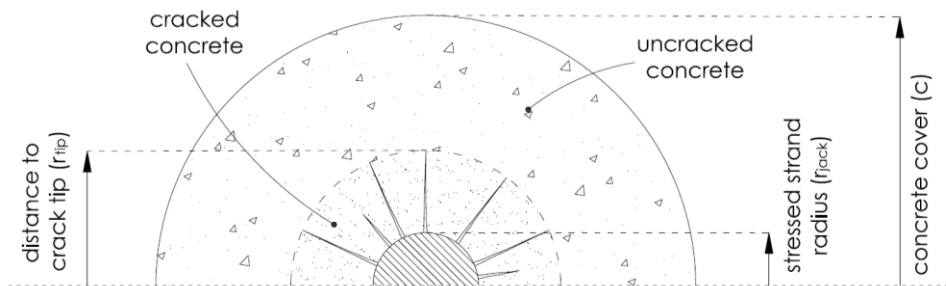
Radial cracking of the concrete around the prestressing tendon.
